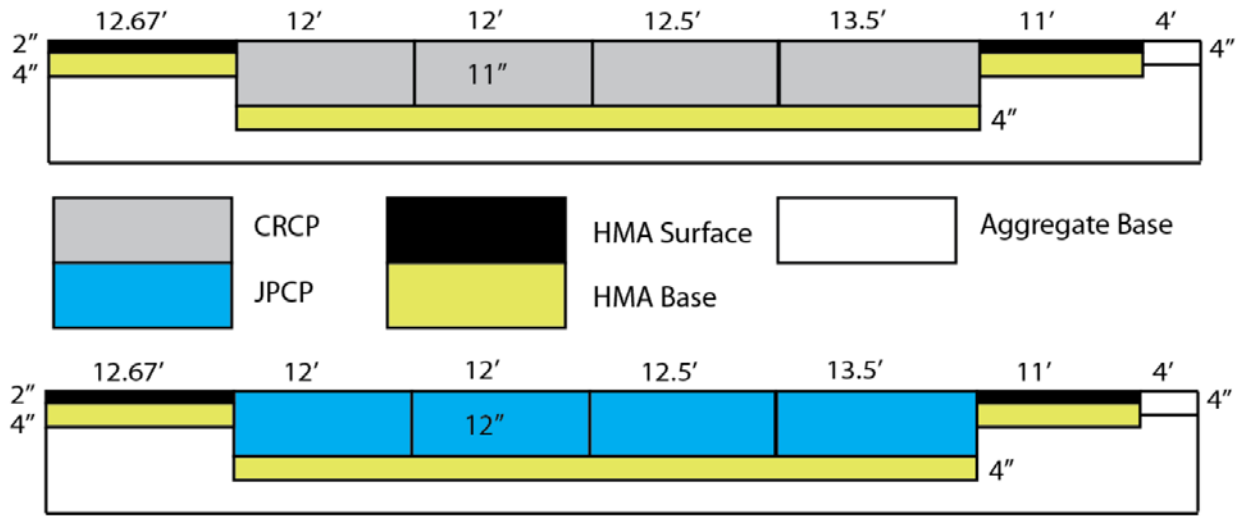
Pavement Structures for Continuously Reinforced and Jointed Plain Concrete Pavement Alternatives, Respectively
